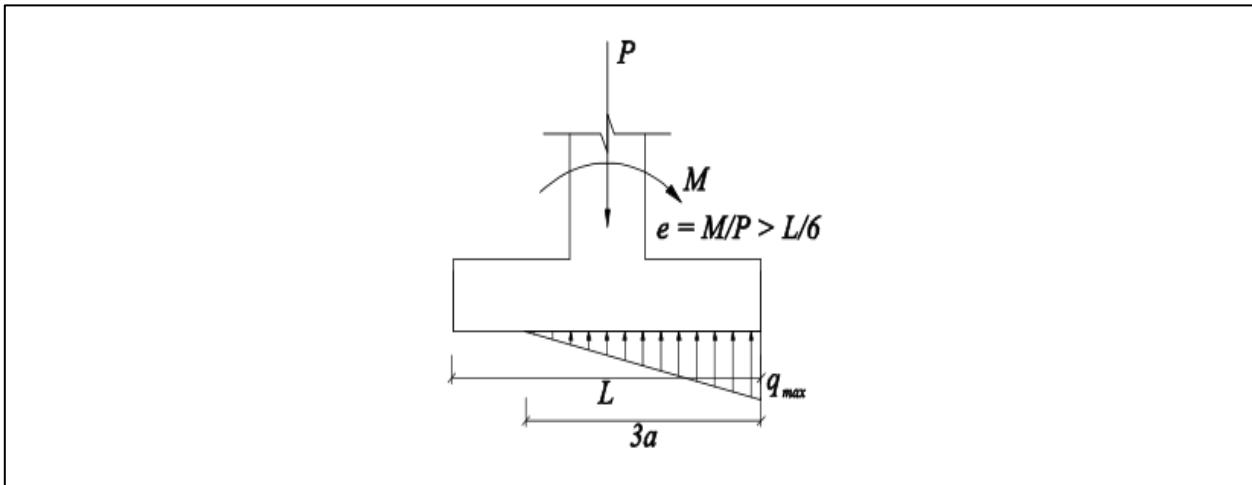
Eccentrically loaded footing ($e > L/6$)
